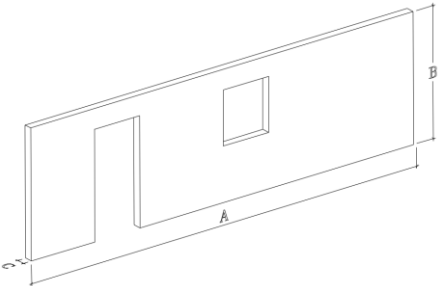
Admissible tolerances for prefabricated concrete panels in our partner facility.
